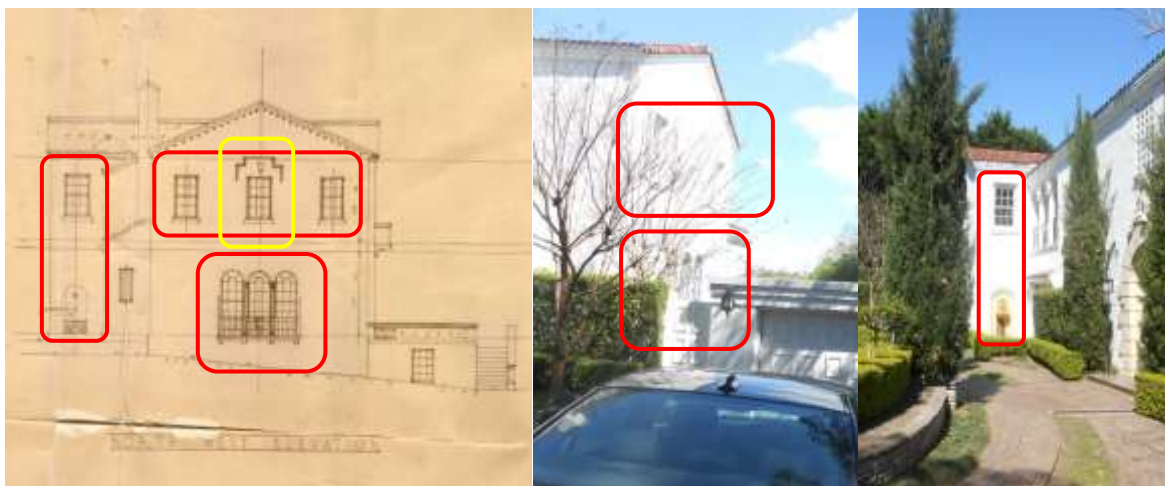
(L) Northern elevation of the 1928 Gilling Plan, (C) oblique view of the northern elevation gable element, and (R) the Gilling Scheme window and fountain element, 2015. Note the central opening to the upper level window has been filled in during the 1960 scheme.
